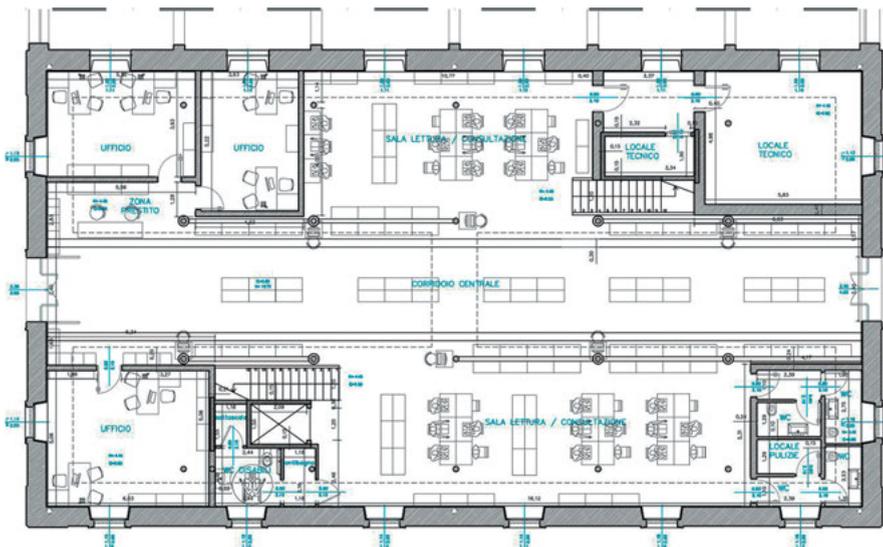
Ground floor plan with the layout of workstations arranged to solve spatial, functional and technological problems. © Studio Feiffer & Raimondi.
